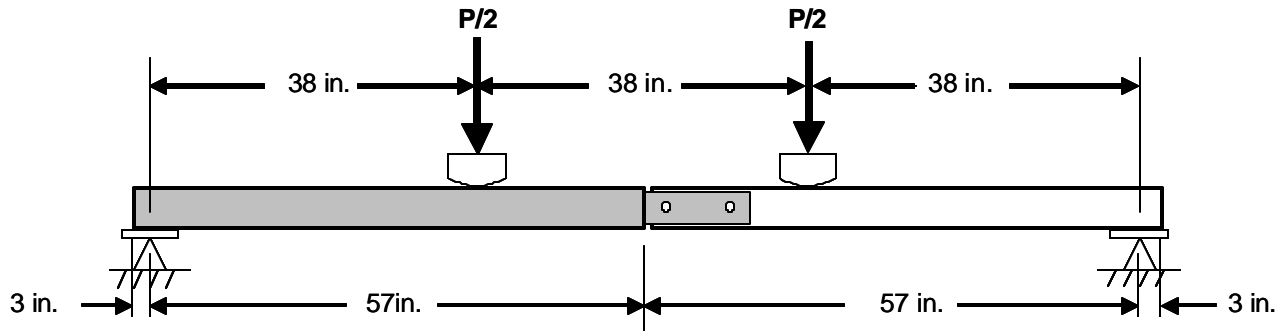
Bending test set-up for *Perma-Column* steel bracket to concrete column connection.
